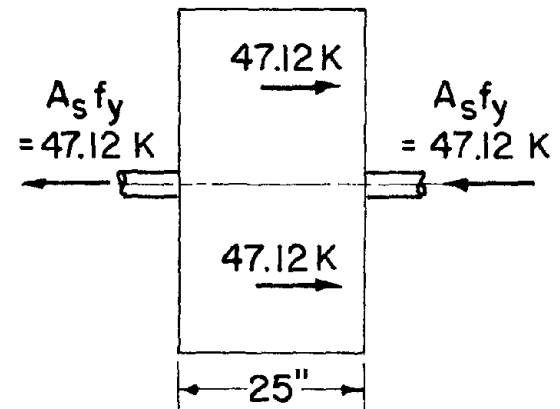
Forces in Test Specimen at Yield of #8 Bar
